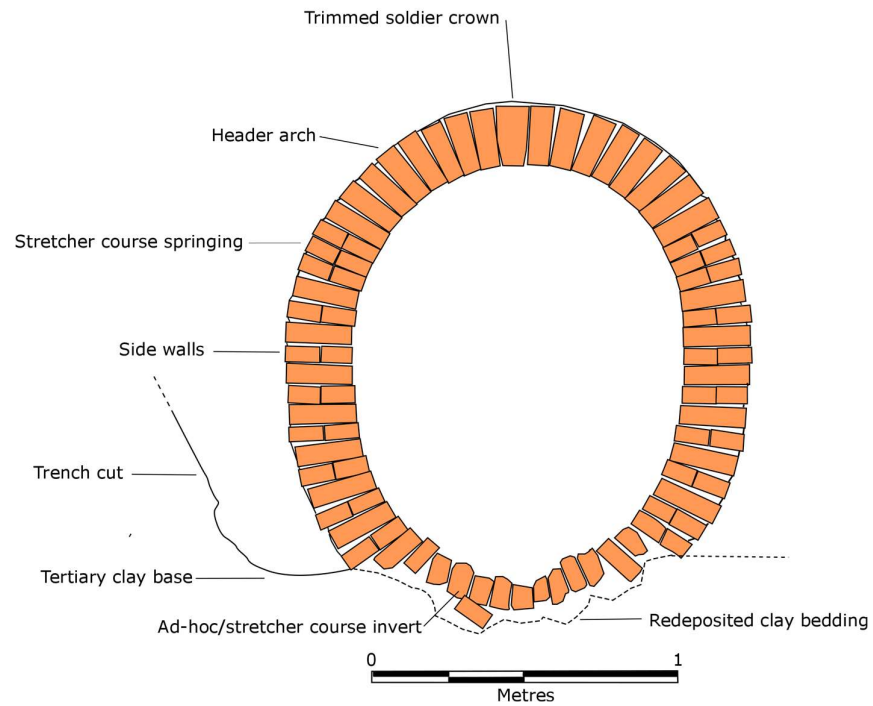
Section through the oviform drain inferred from the excavation of Sondage 3.
